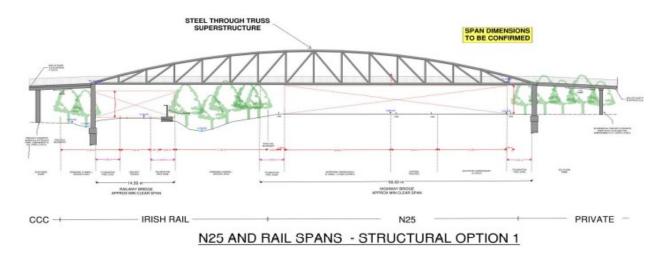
Structural option 1 indicative elevation with N25 span, Irish Rail span start of approach ramps
